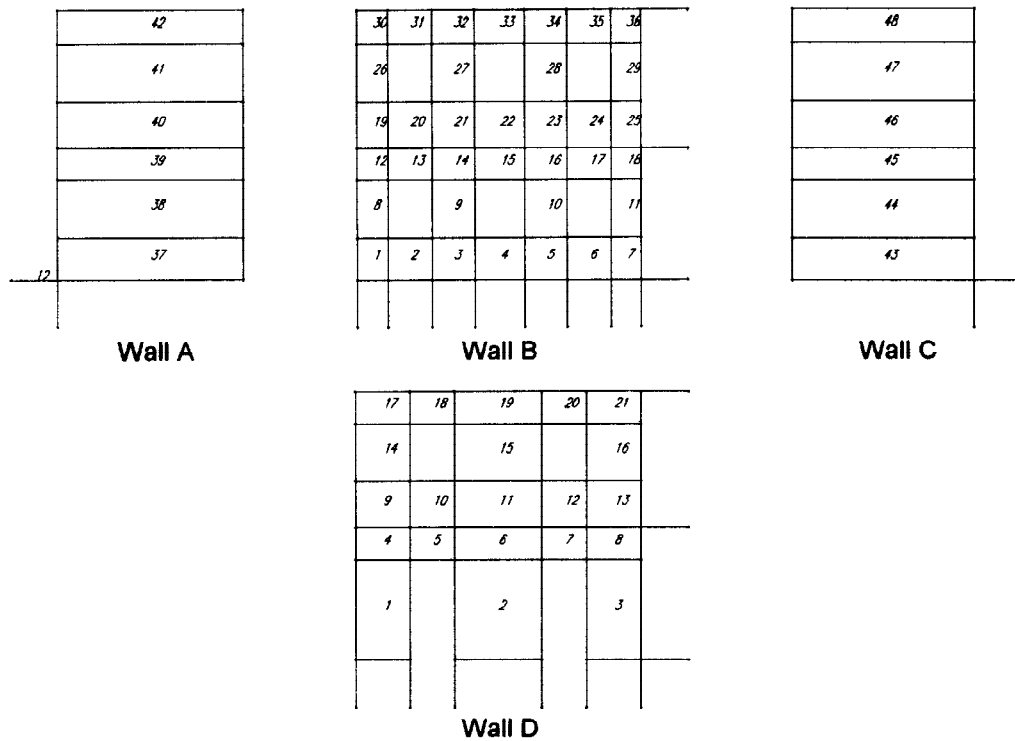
Numerical model of the full-scale brick masonry building prototype.
